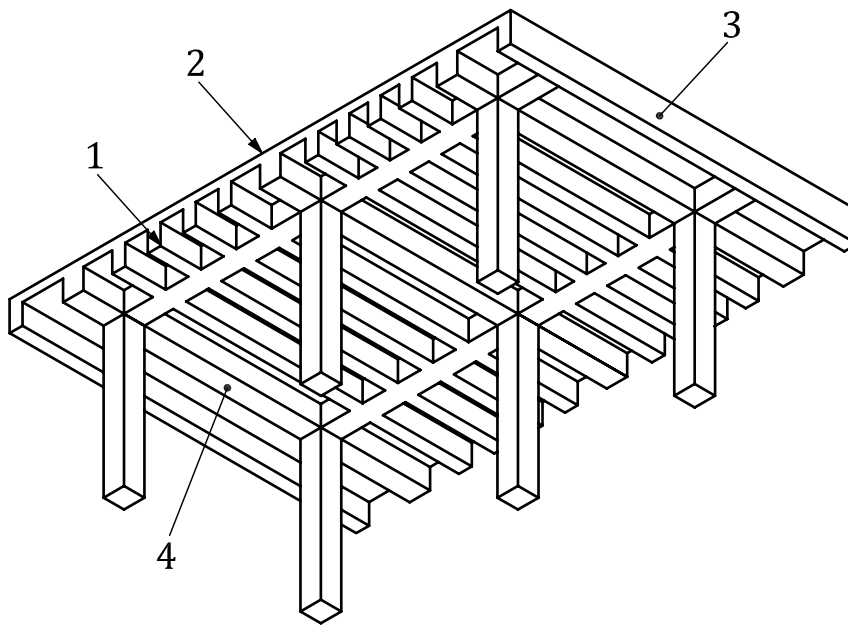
Use of two-direction intermediate beams in the slab-on-girder floor system
